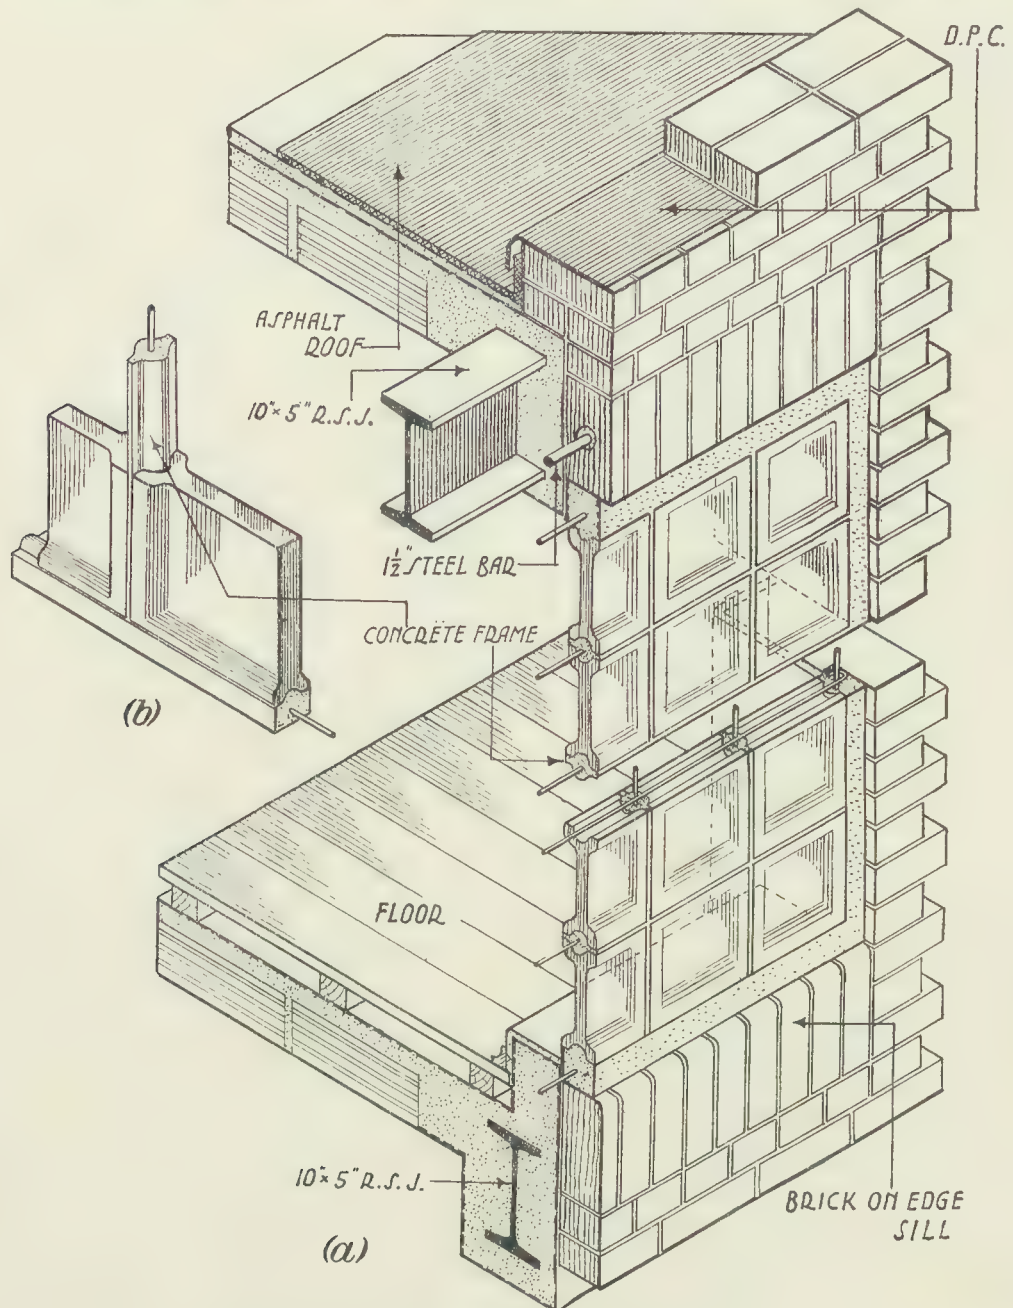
CONSTRUCTION OF GLASS PANEL WALL
